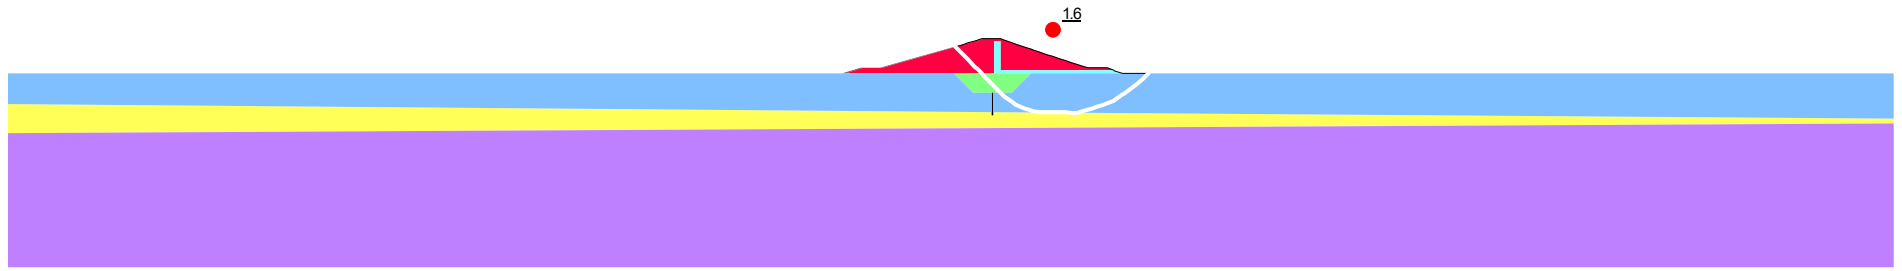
Alternative 1 End of Construction Downstream Factor of Safety— Birch
